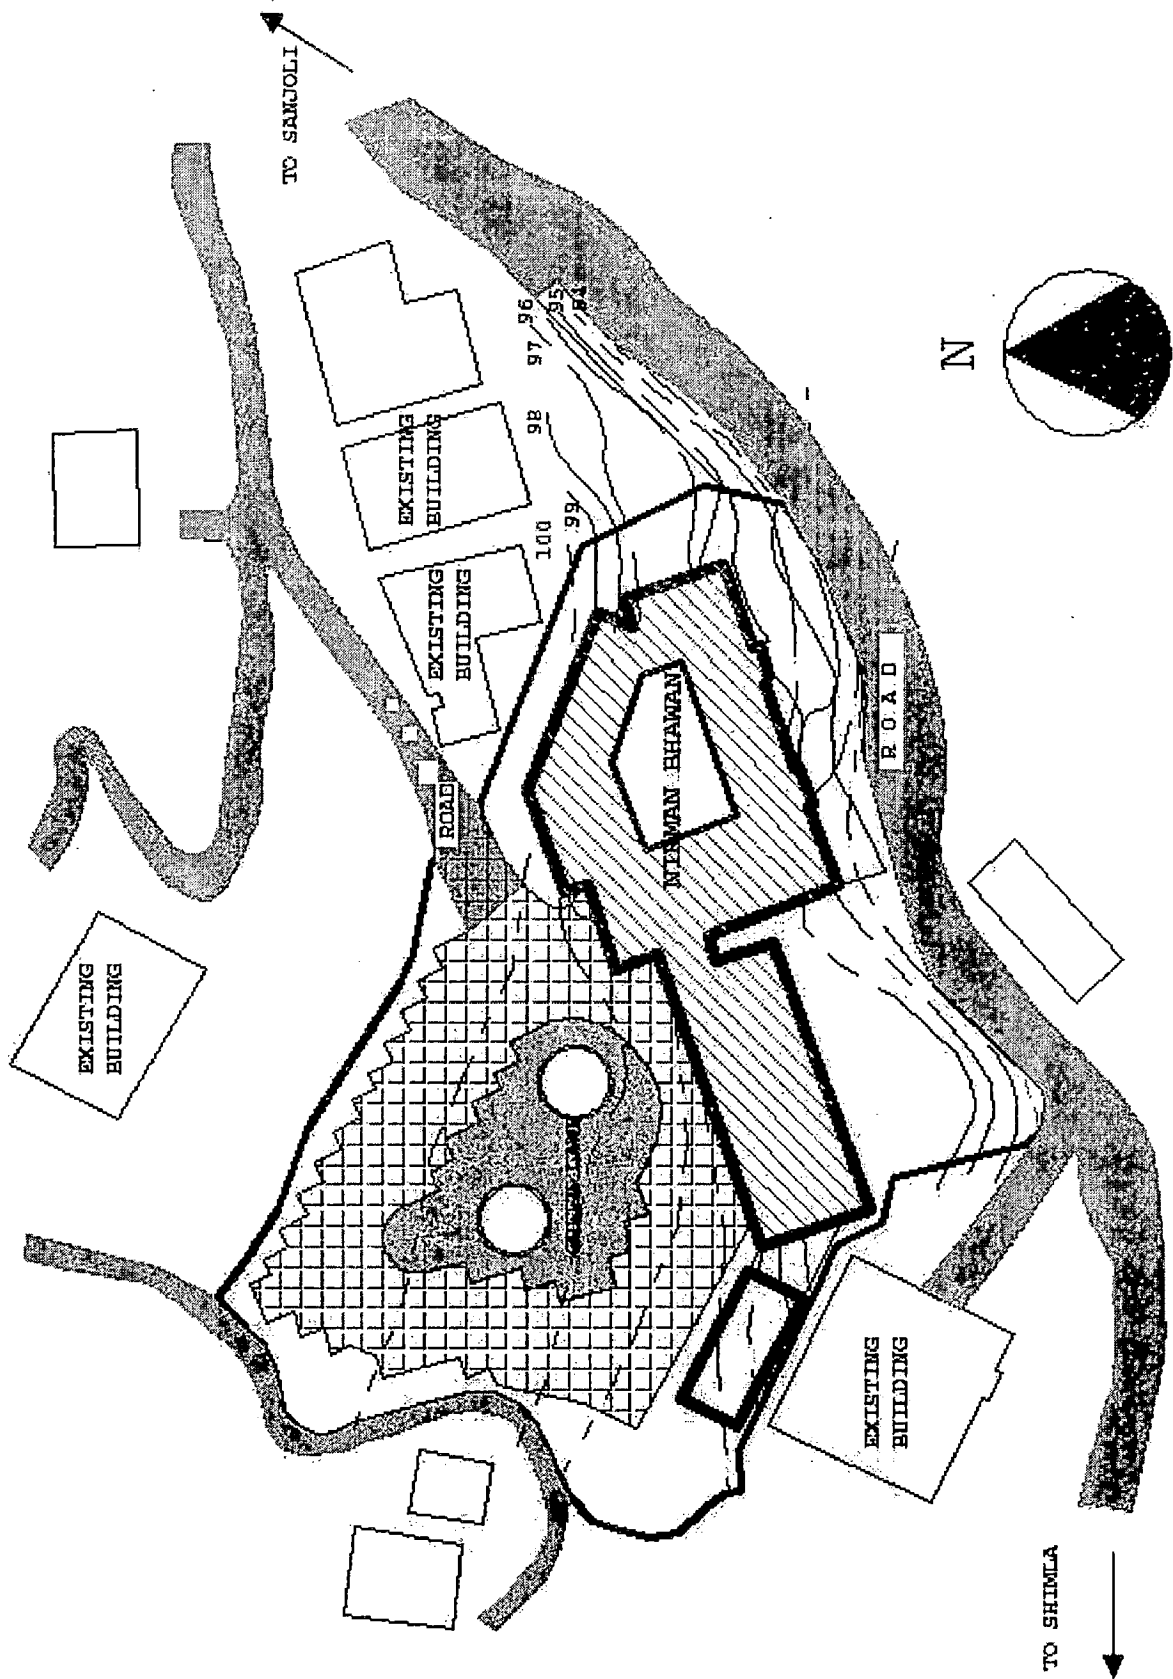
Site Plan of Nirman bhawan, Shimla
